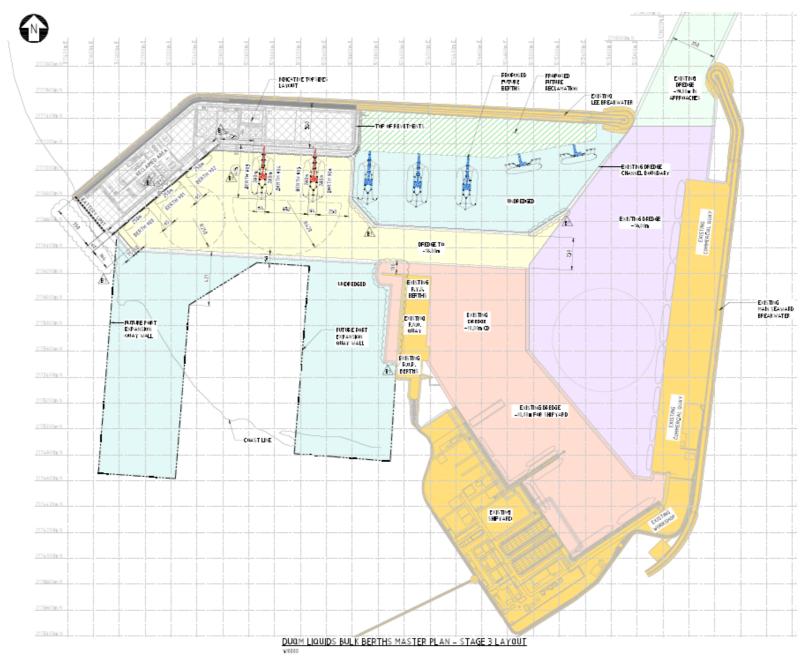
LAYOUT FOR THE PROPOSED LIQUID BERTH TERMINAL IN DUQM
